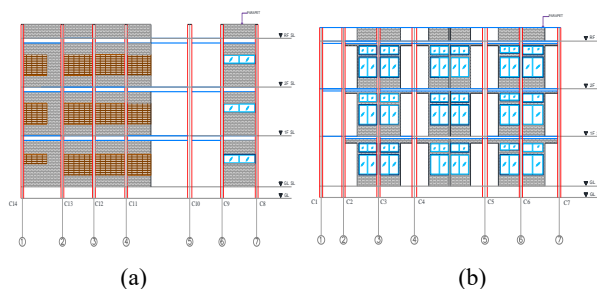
(a) Interior and (b) Exterior frame of Building-4
